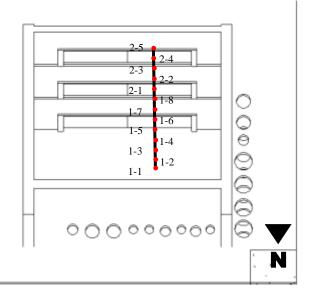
TC inside elevator shaft from 5th to 3rd floor
